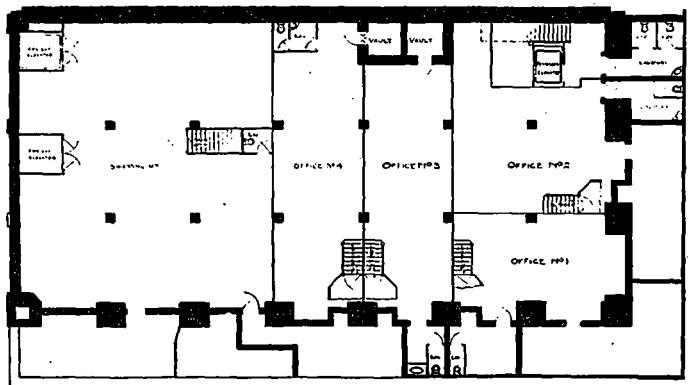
BASEMENT FLOOR PLAN, OGILVIE BUILDING, TORONTO, SHOWING LOCATION OF STAIRWAY AND ELEVATORS, WHICH ARE ENCLOSED IN CONCRETE SHAFTS.
